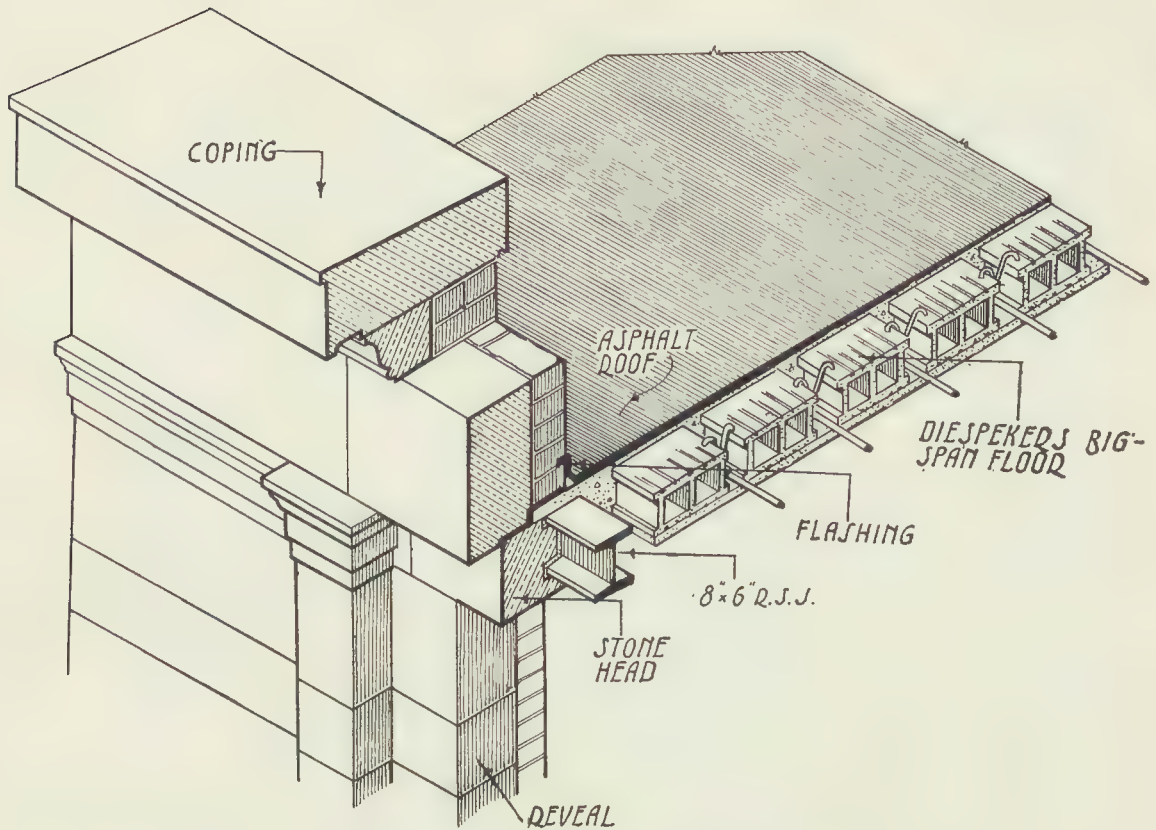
CONSTRUCTION OF FLAT ROOF WITH HOLLOW BLOCKS AND COVERED WITH MASTIC ASPHALT
